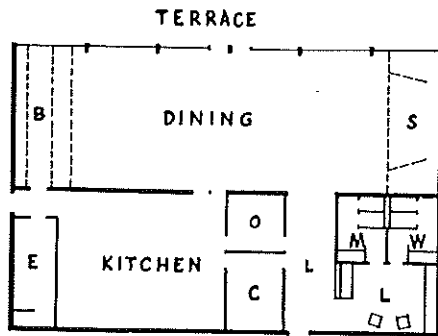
Floor plan of a restaurant or cafe. The building may serve various types of business. Ceiling height is 12'-0" for larger spaces.
